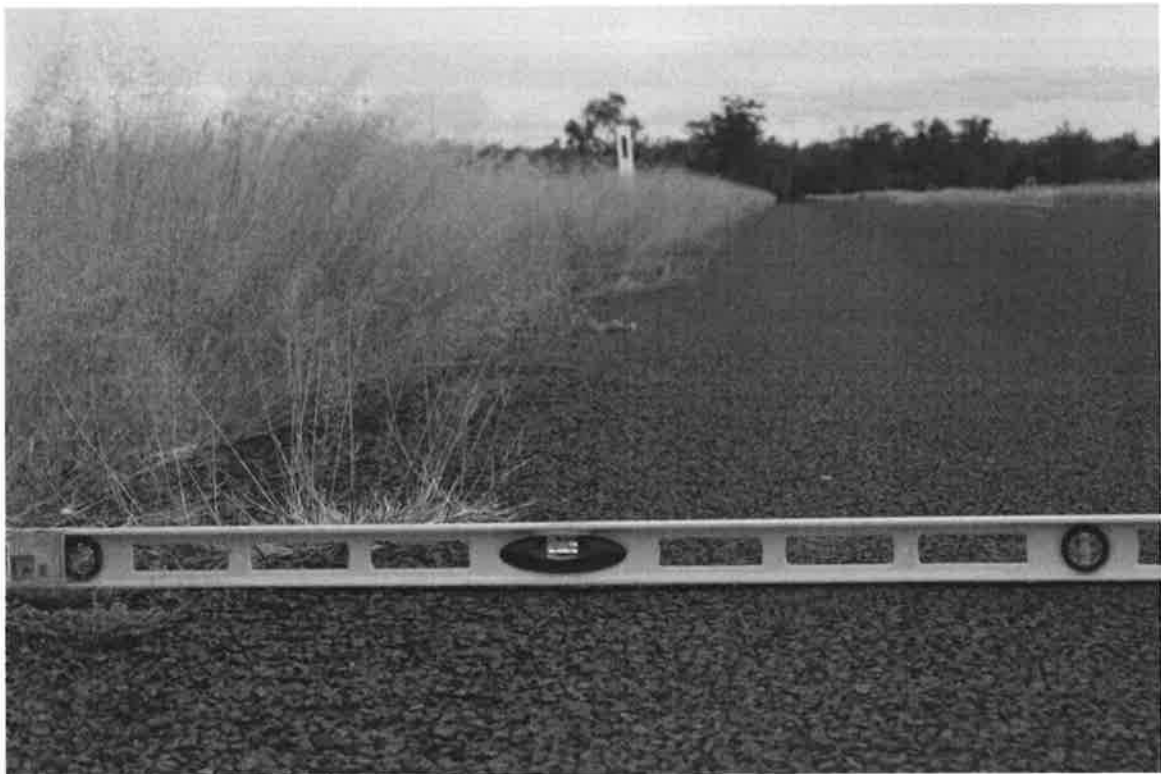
Sunnygirl Access – Yelarbon-Texas Road; grass growth through pavement edge / shoulder
